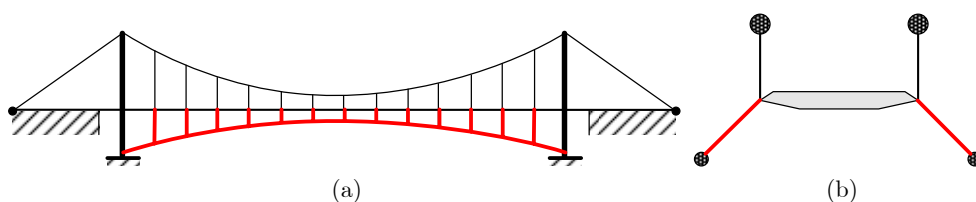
Suspension scheme with secondary cables lying on 45-deg planes (a); cross-section (b)
